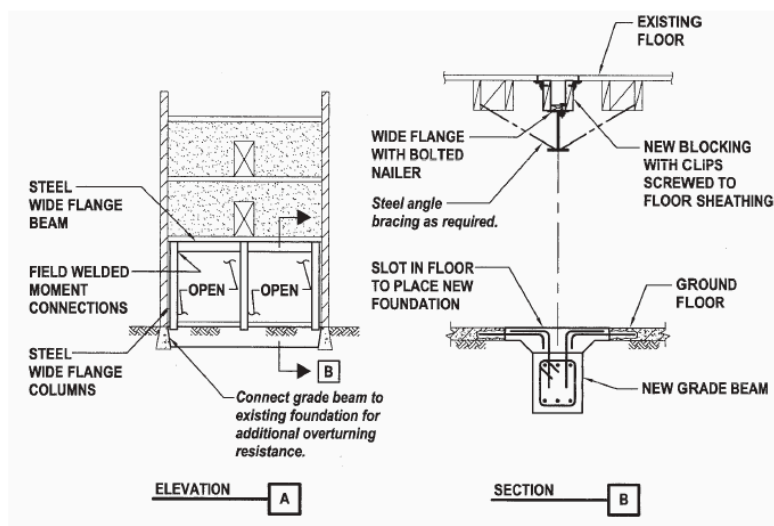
Add New Moment Frame as Crosswall
